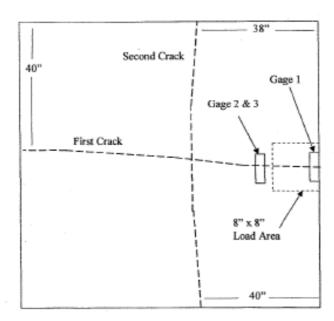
Test #1b, Sketch of Slab #1 After Failure in Monotonic Loading
